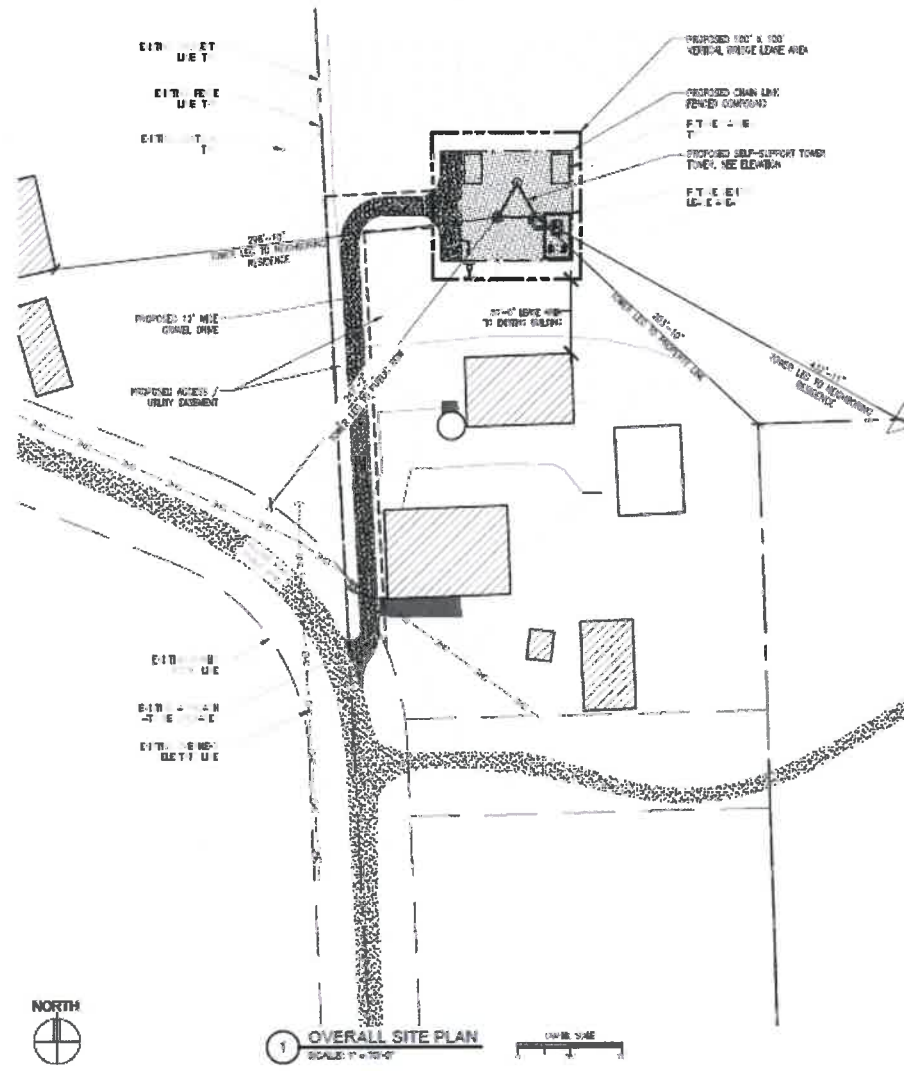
Site Plan for the proposed self-support tower off Hillside Road. The full plan set is included with the application.
